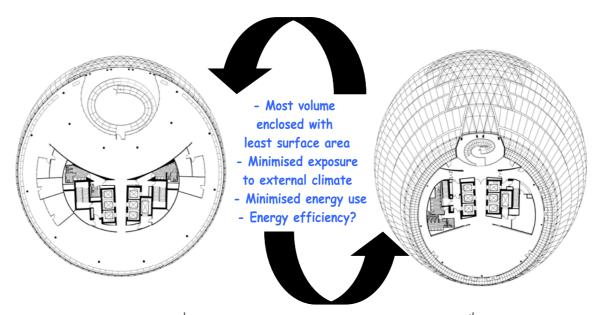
GLA Building's 3rd floor plan (Image source: © Foster and Partners)
